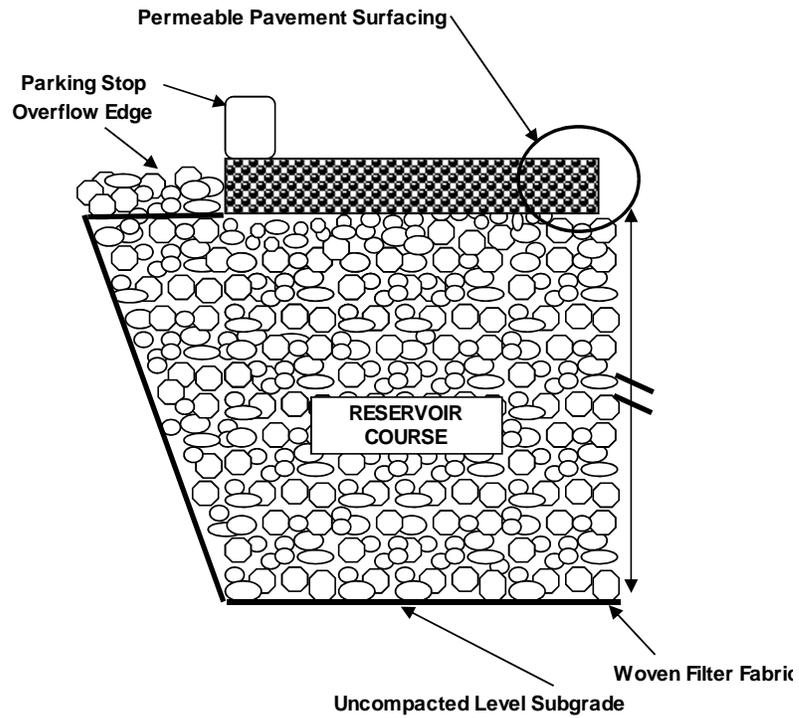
Typical Porous Pavement Section Infiltrating to Subgrade
